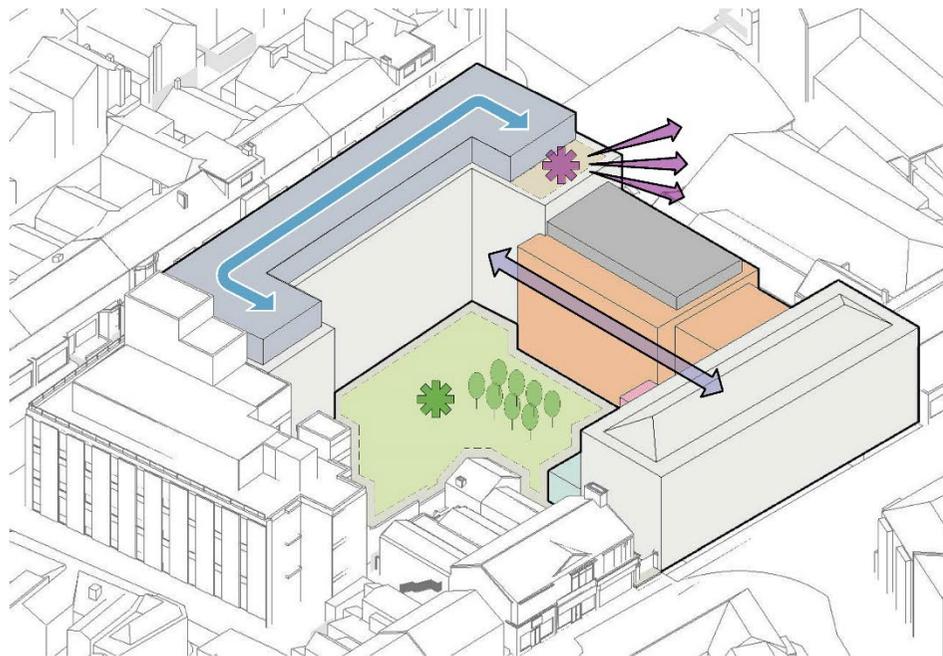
Design Development Sketches – Enhancement and Connection
